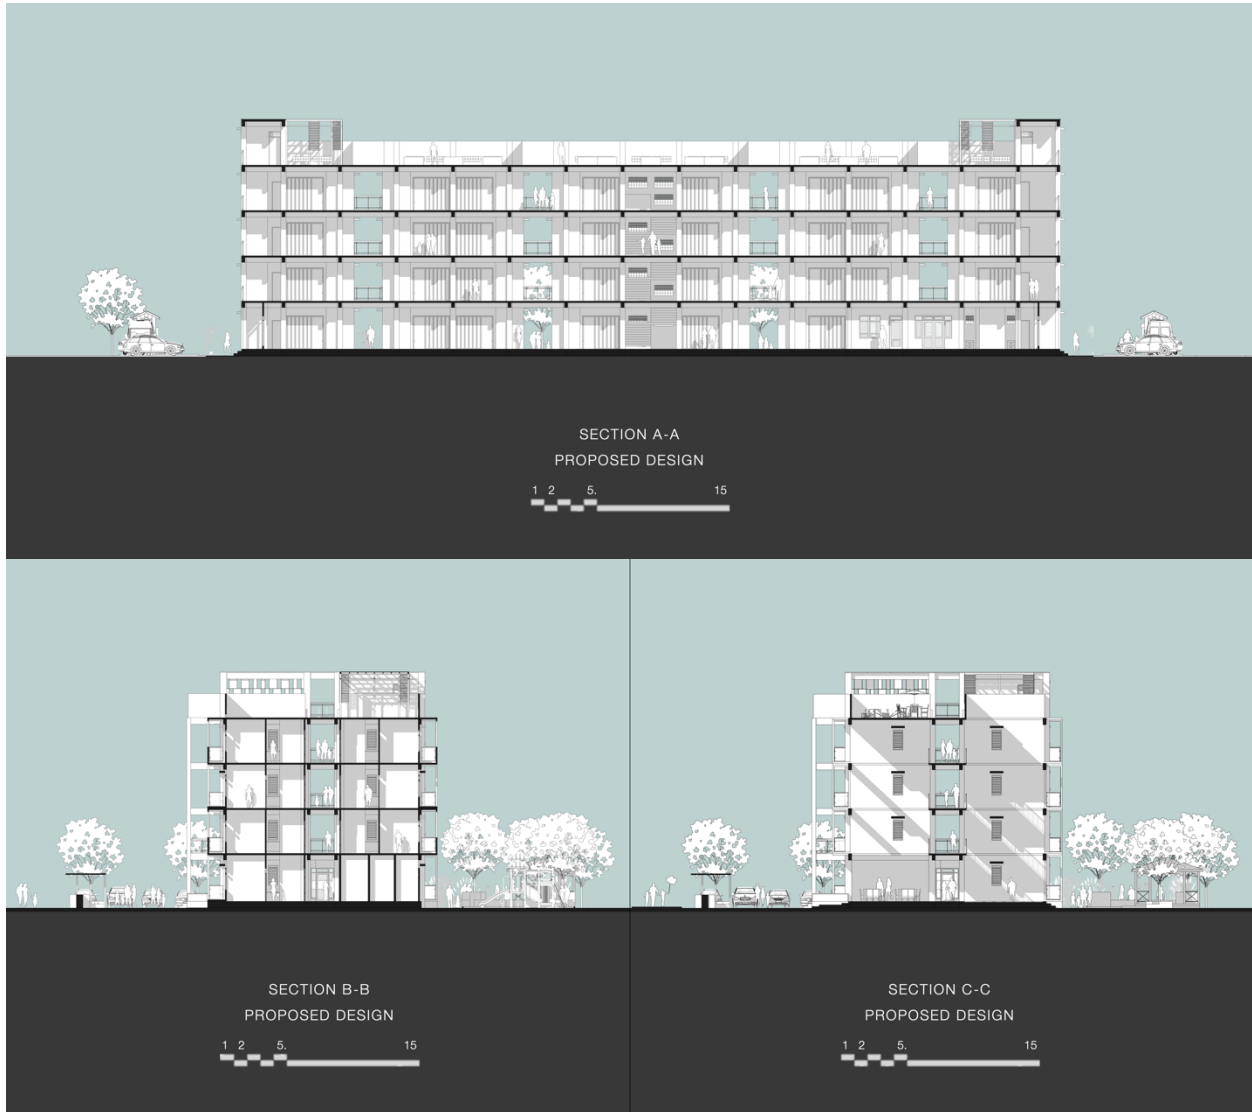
Section: (a) Section A-A; (b) Section B-B; (c) Section C-C
